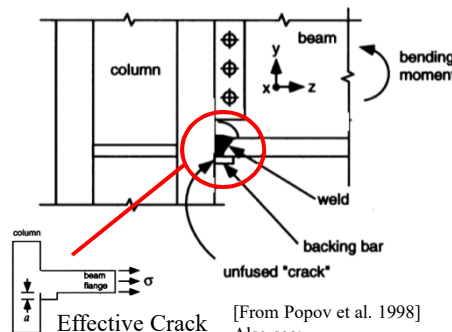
Some failure modes of the welded beam-to-column connection [From Popov et al. 1998]
